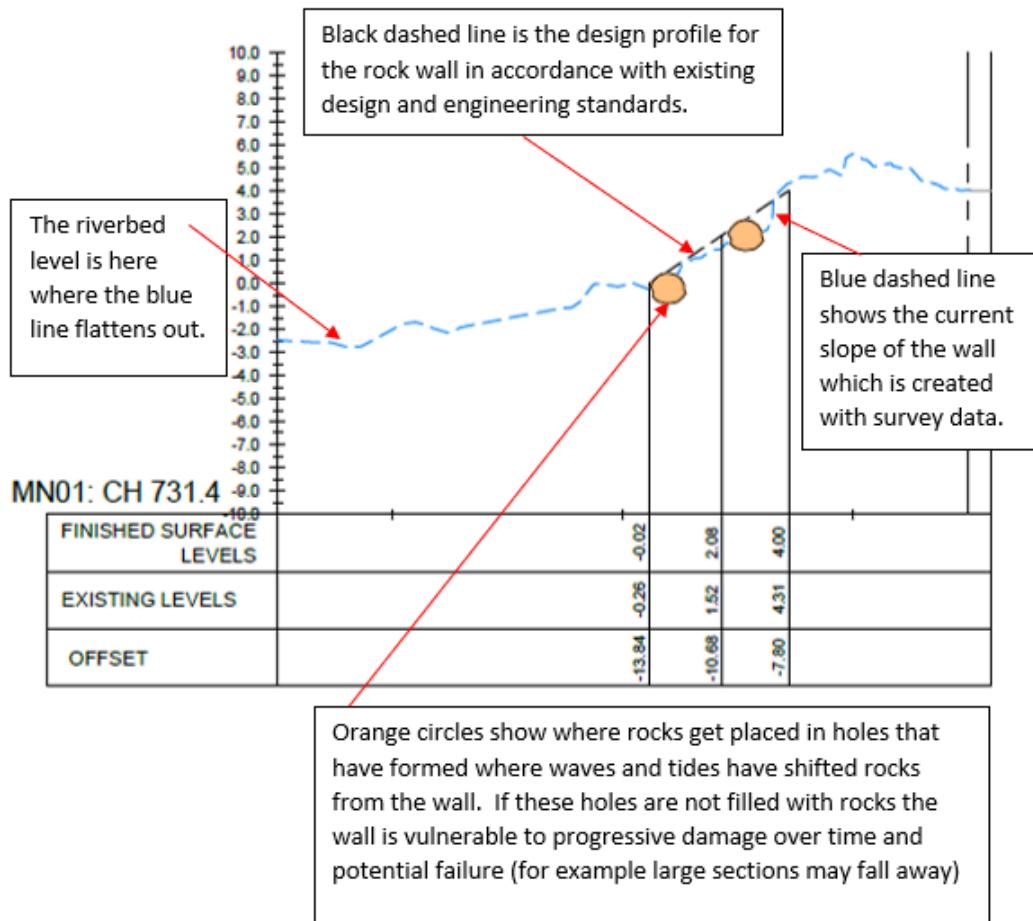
Placement of rock at breakwall head cross section from Dreft REF
